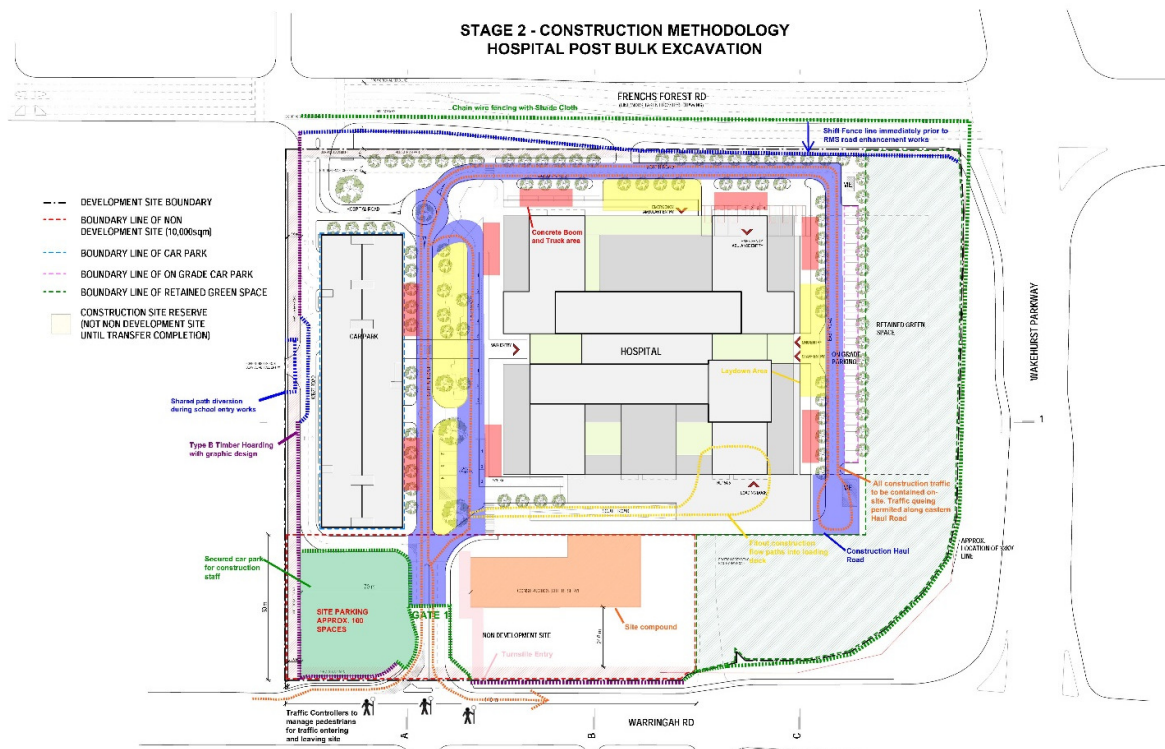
Site layout, parking and accommodation Post Bulk Excavation
